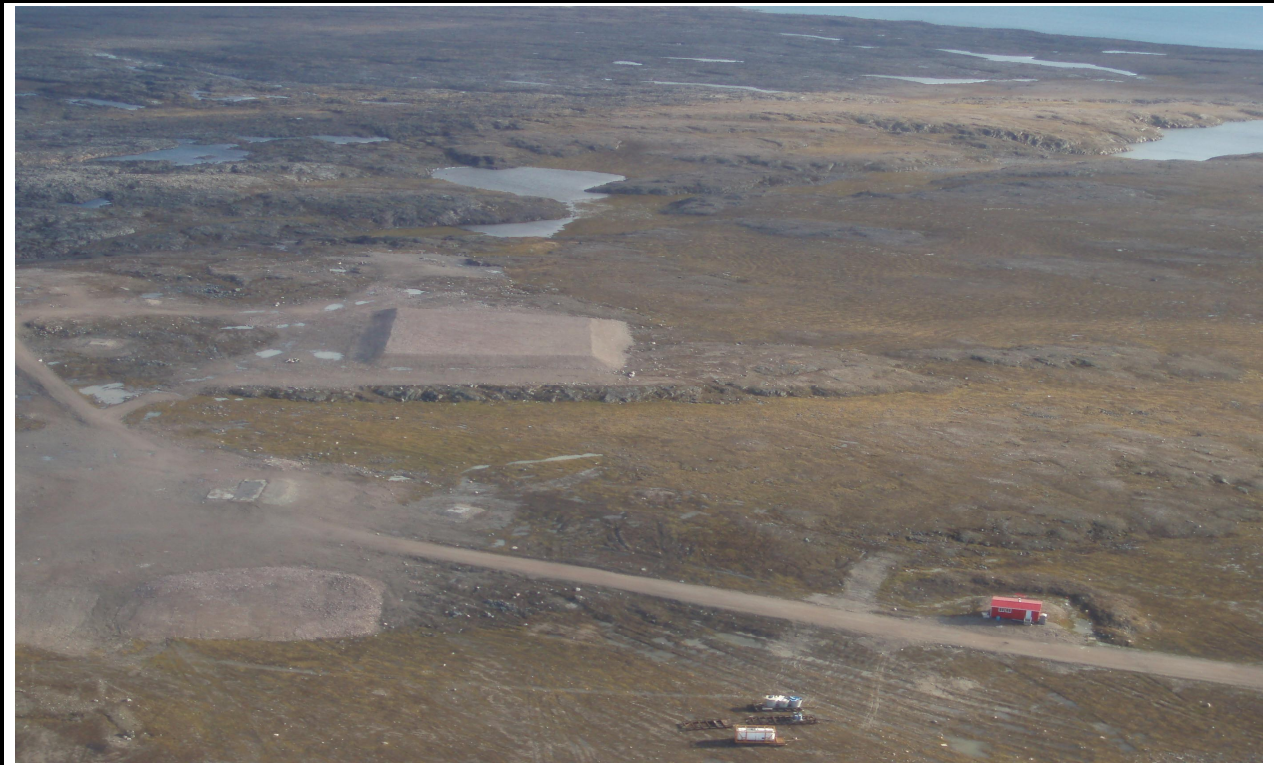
Picture 59 NHWLF – Aerial View of the Landfill, Minor Ponding near the NW Corner
